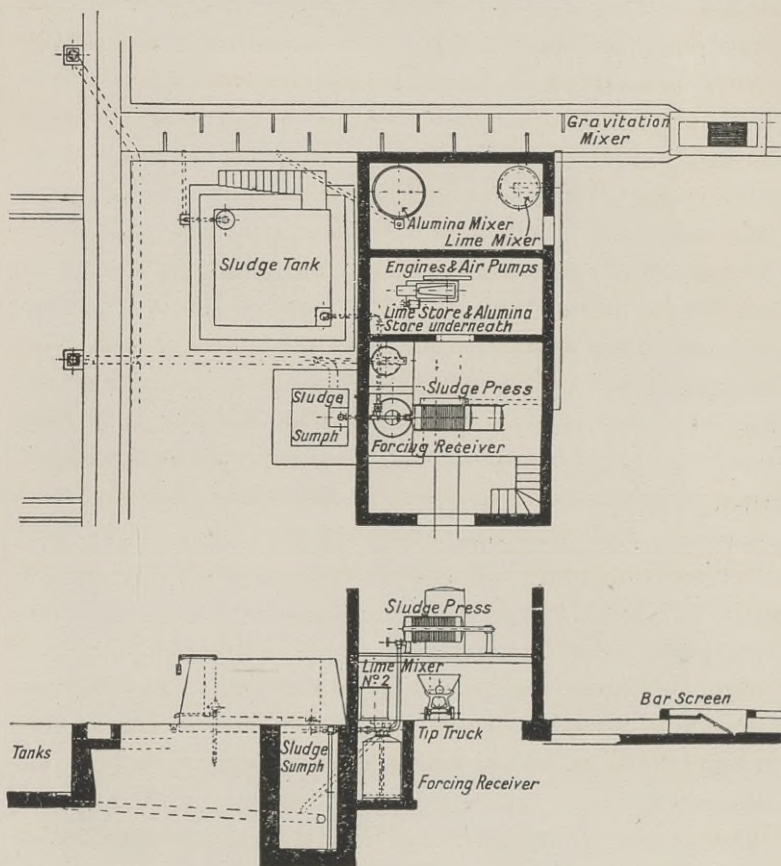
Plan and Section of a Typical Sludge Pressing Plant for a Small Town.
